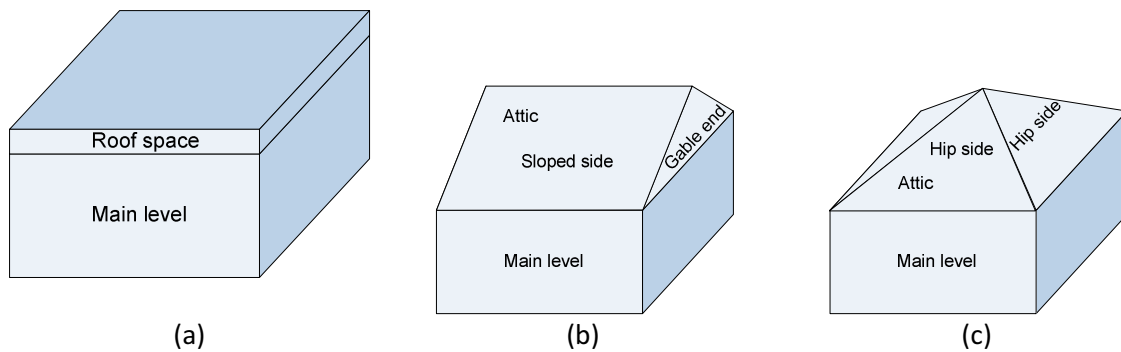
Roof space or attic configurations (a) flat roof space, (b) gable type attic, and (c) hip type attic
